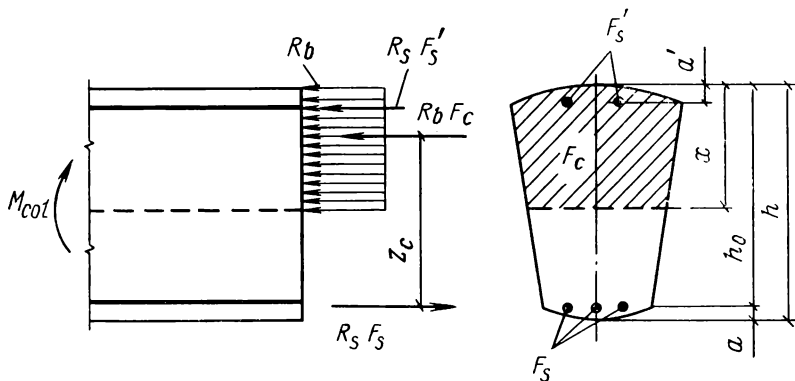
To the plastic design of a beam symmetrical in cross section
